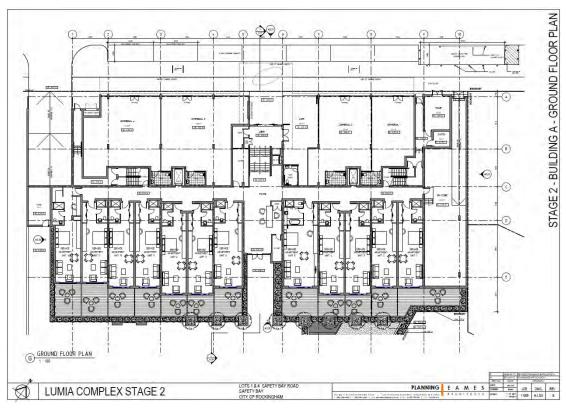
Ground Floor Plan of the Mixed Use development approved in May 2012
